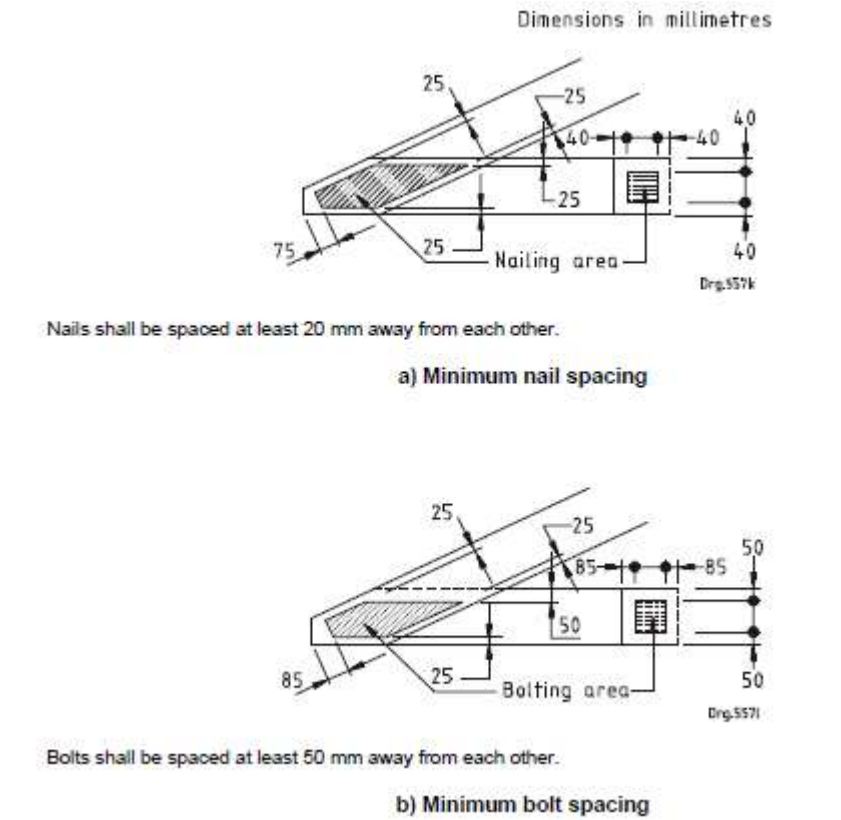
Nail and Bolt Spacing in Joints Between Timber Members
